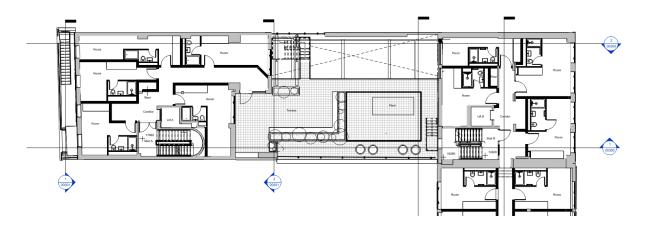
The extent of roof terrace at the bottom of the plan is limited by planting and seating
